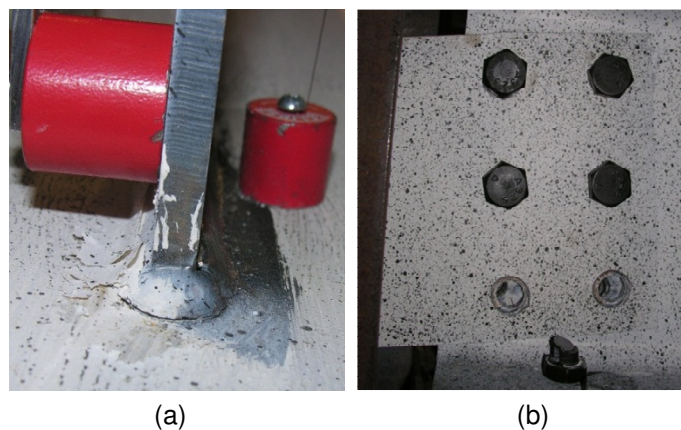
Typical unstiffened EST failure modes (a) fracture of weld on tension side, and (b) shear of bolts in outer row(s)
